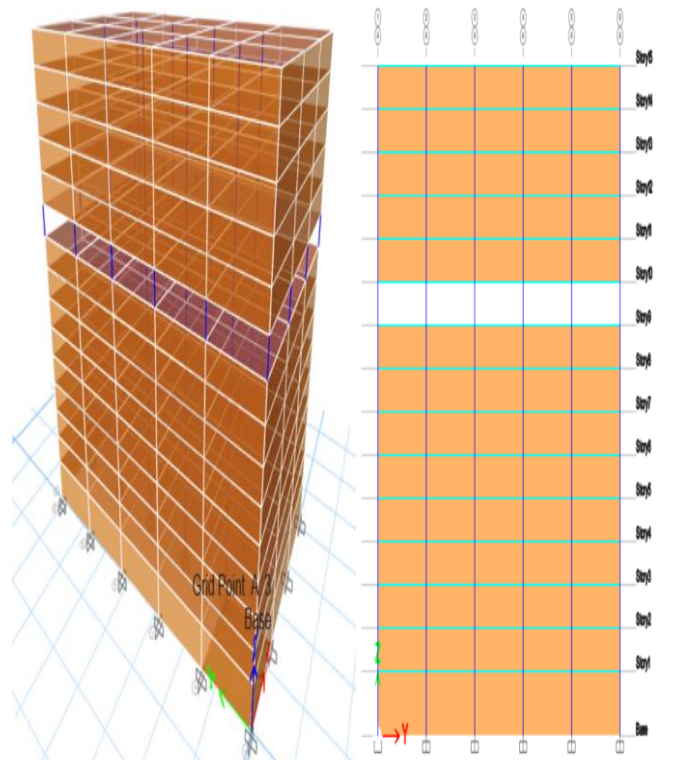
3D and Elevation view of Model, 10th floor open and rest all filled with infill walls
